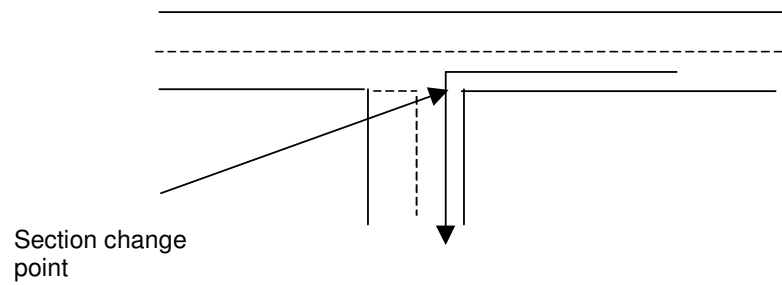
Section change point when turning right or left at junctions or crossroads, off the main carriageway
